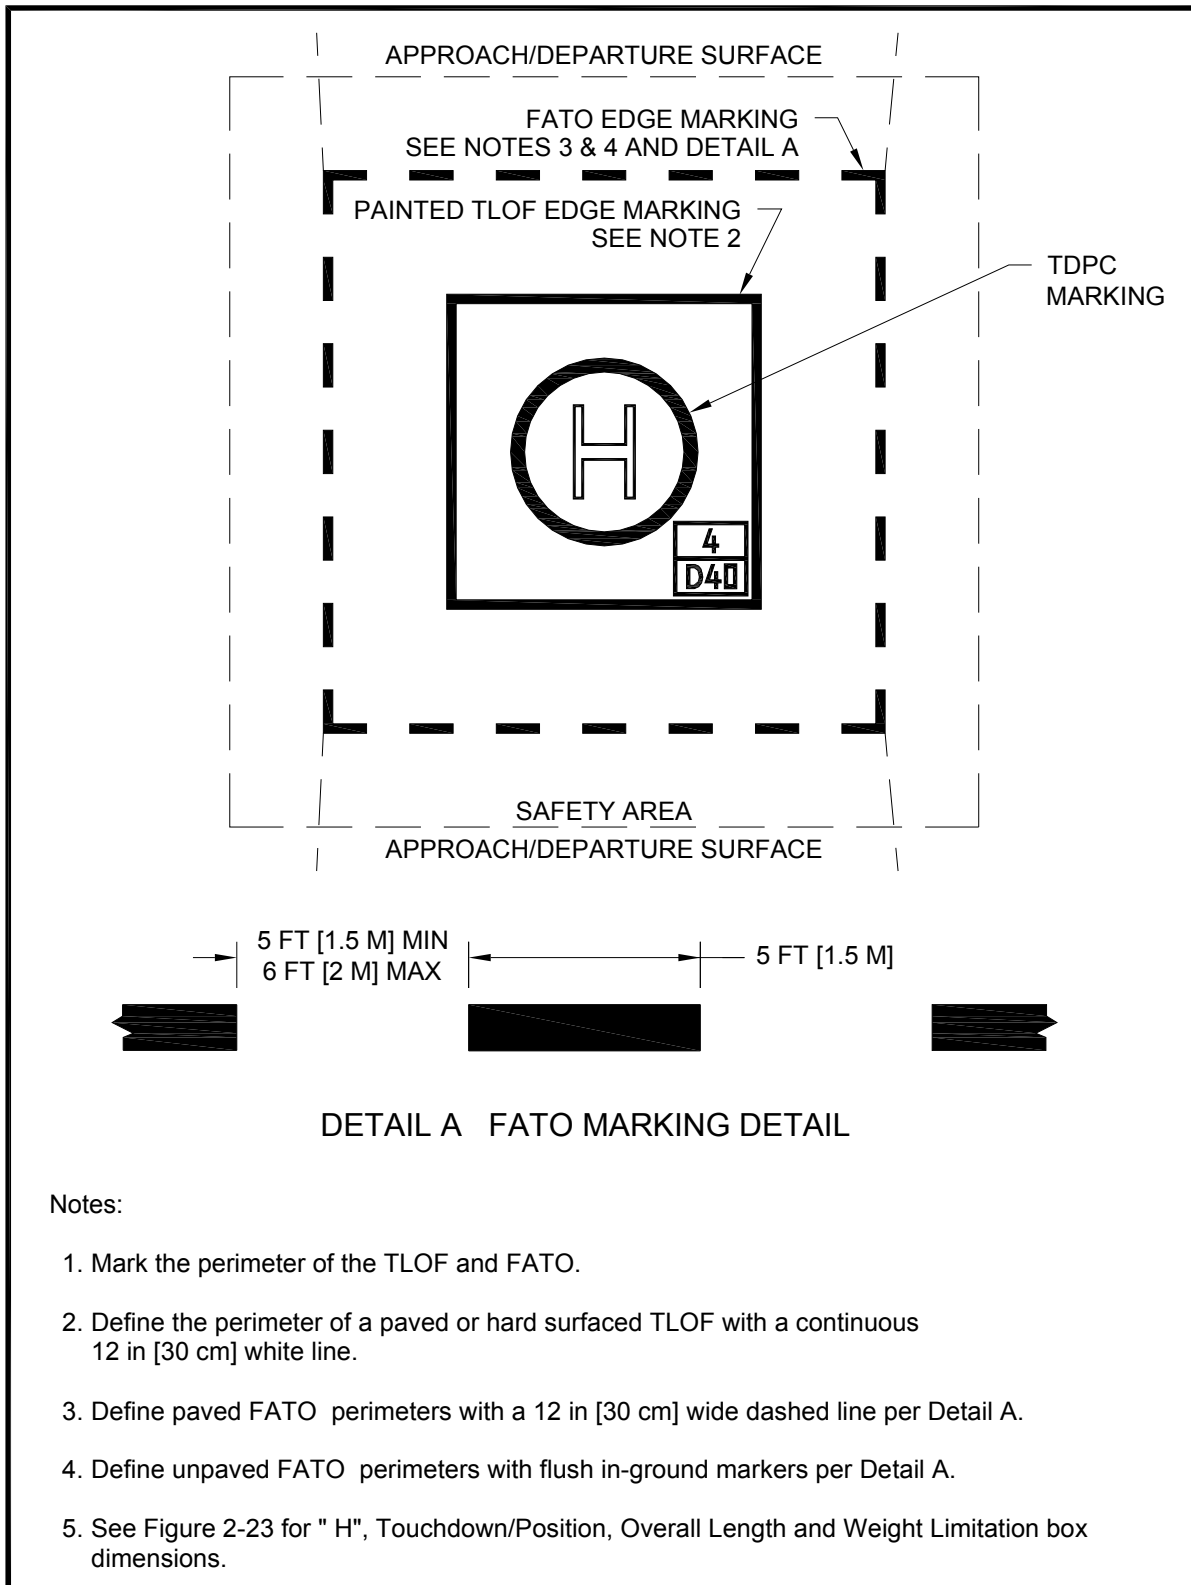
Extended Pavement / Structure Marking: General Aviation
